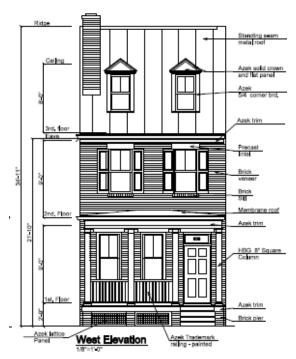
Approved but as yet Unconstructed New Townhouse at 606 S Fairfax
